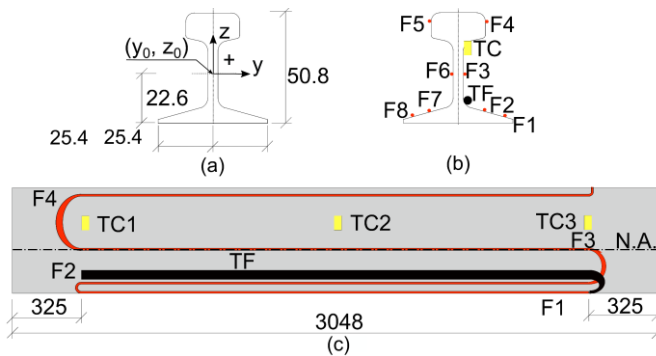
Lab buckling test specimen (in mm). (a) rail cross-section dimensions, (b) fibre locations on cross-section, (c) longitudinal dimensions and fibre layout.
